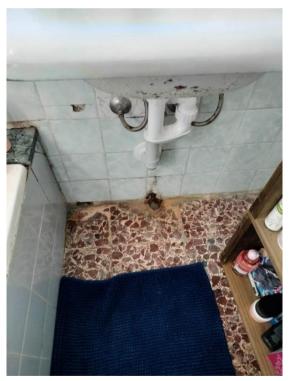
Bathroom in annex of 75 Crown Street showing mould and rust damage in floor and tiles. Source: Curio 2023
